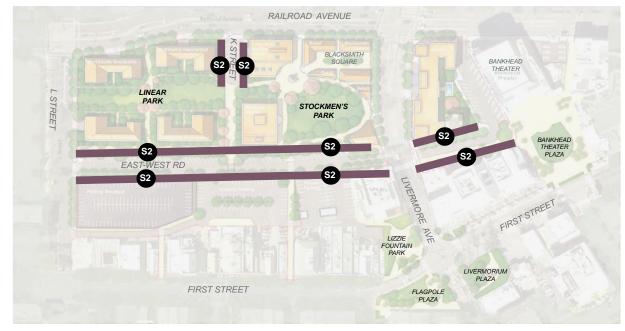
Streetscape Parkway Edge Locations in the Downtown Concept Plan
